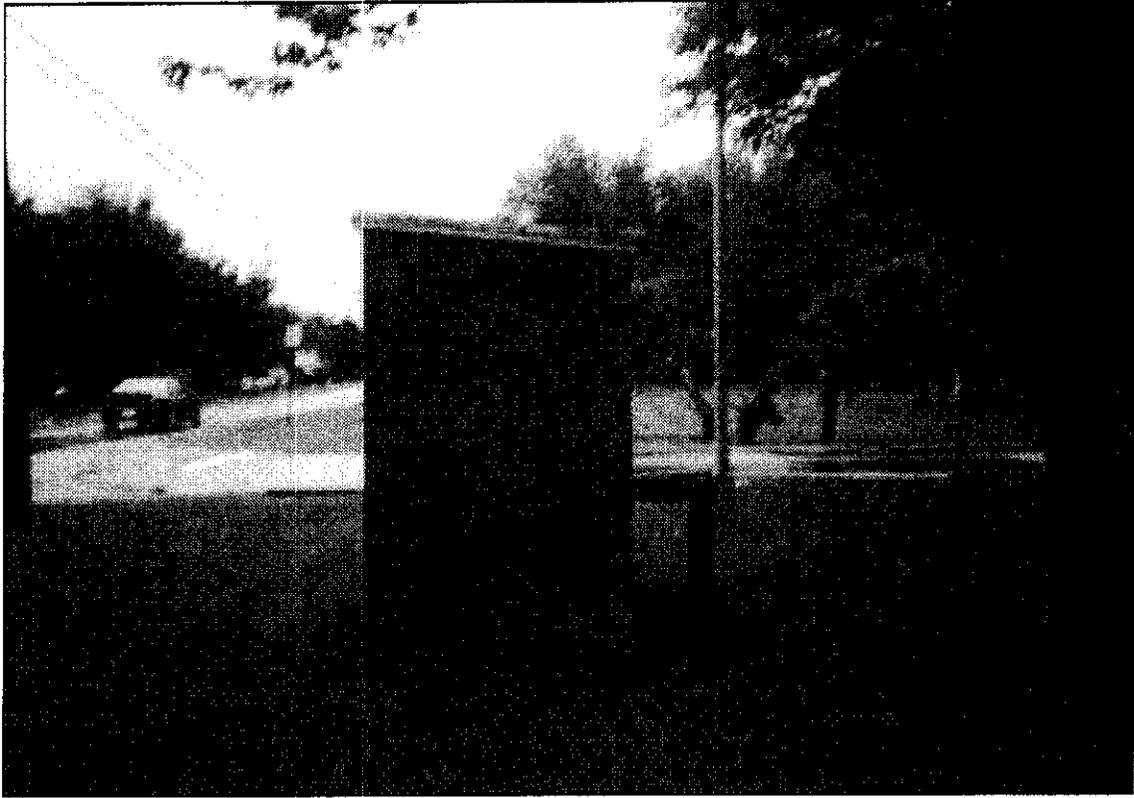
Whitehall Memorial USARC Utility Building, facing south.
